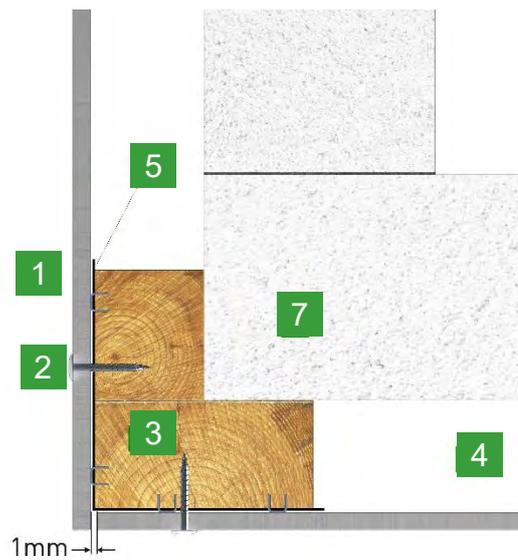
Horizontal section. Jamb with Hardie® Panel board.
